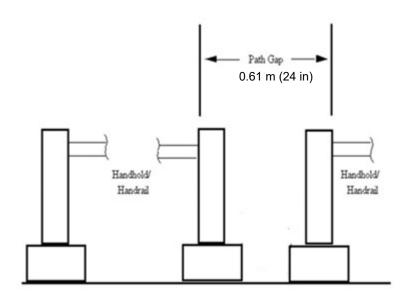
HANDRAIL/HANDHOLD GAPS
